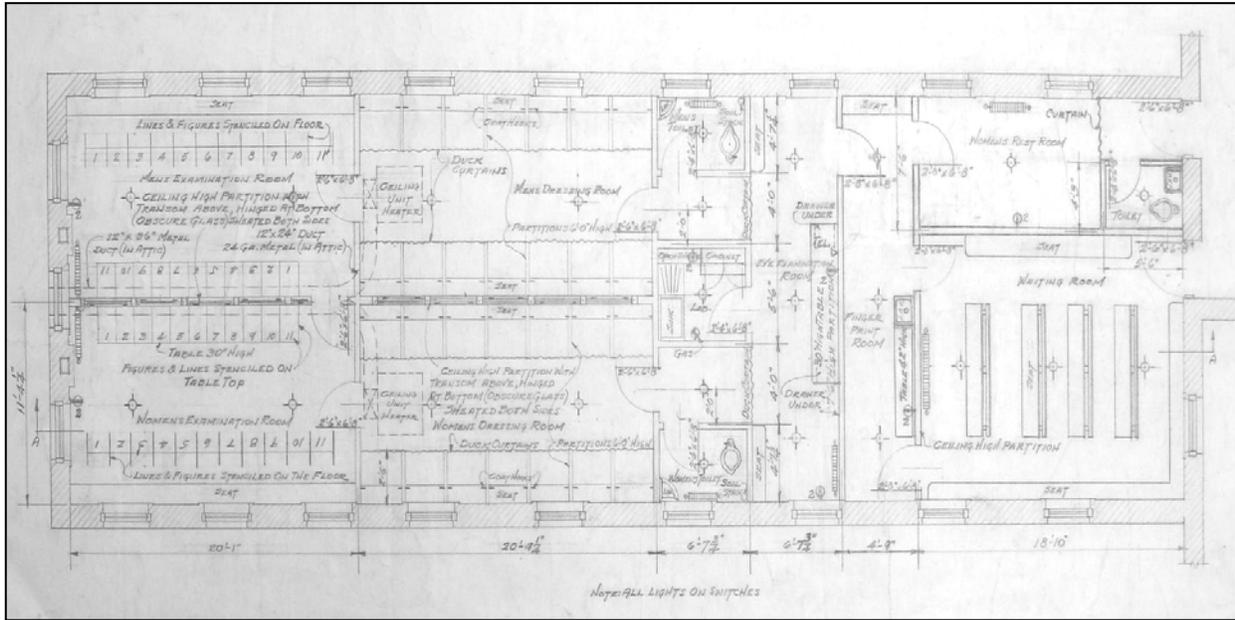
Alterations to Spaces C-101 and C-115 for Physical Examinations, Building No. 27, Hill Shops, Springfield Armory U.S.A., July 10, 1942; plan detail, not to scale.
